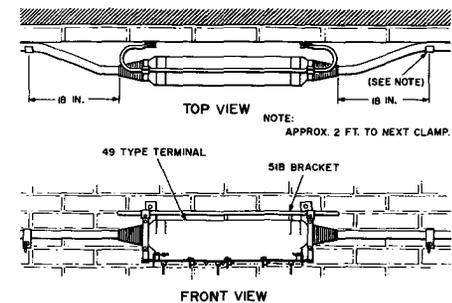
Typical Bracket and 49-Type Terminal Mounting
